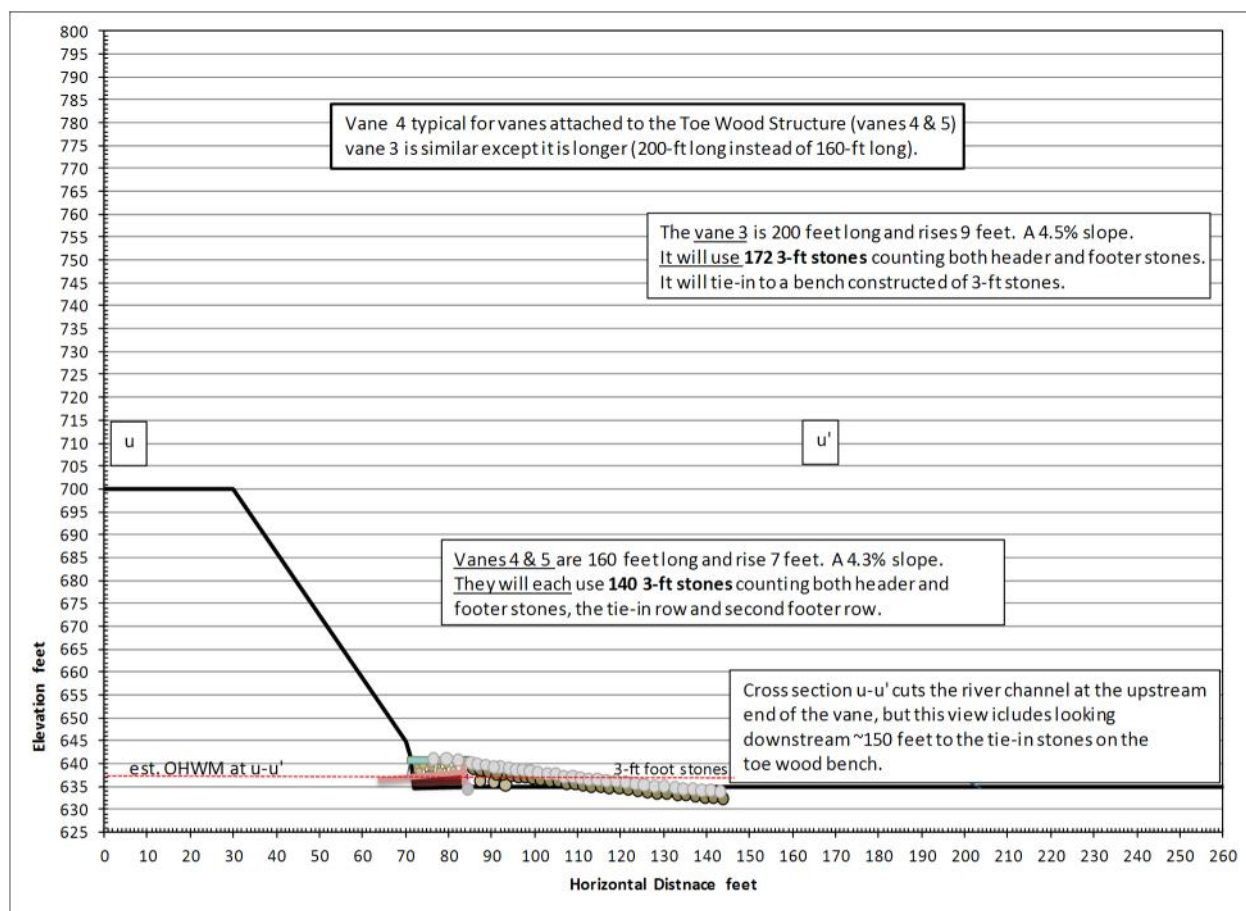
Cross section u-u' showing vane 4 attached to the toe wood structure. This is typical for vanes 4 and 5.
